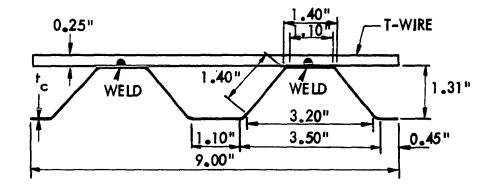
Typical profile of steel deck G (CATEGORY II)
